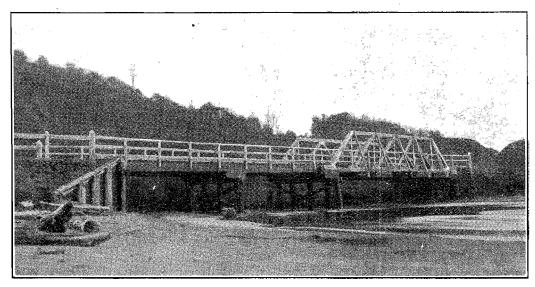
Bridge over Kennet River, Apollo Bay-Wye River Road.
